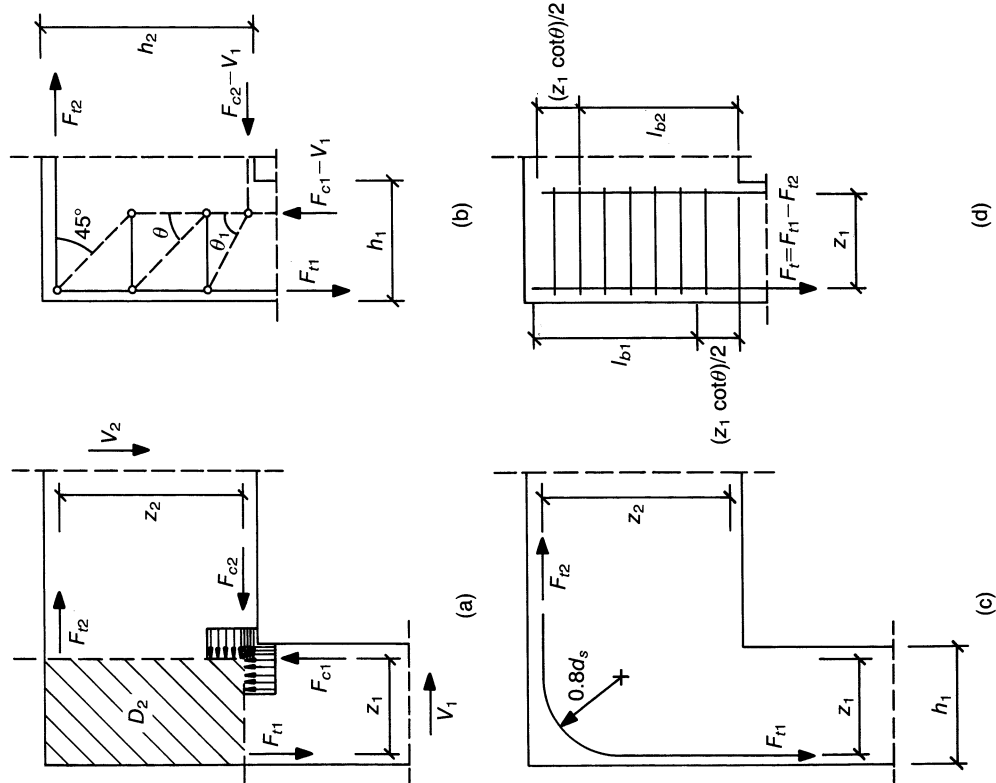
Frame corner with closing moments: (a) input forces; (b) truss model; (c) bent around bars; (d) anchorage lengths of column reinforcement,  $l_{b1}$  (tensile) and  $l_{b2}$  (compressive)
